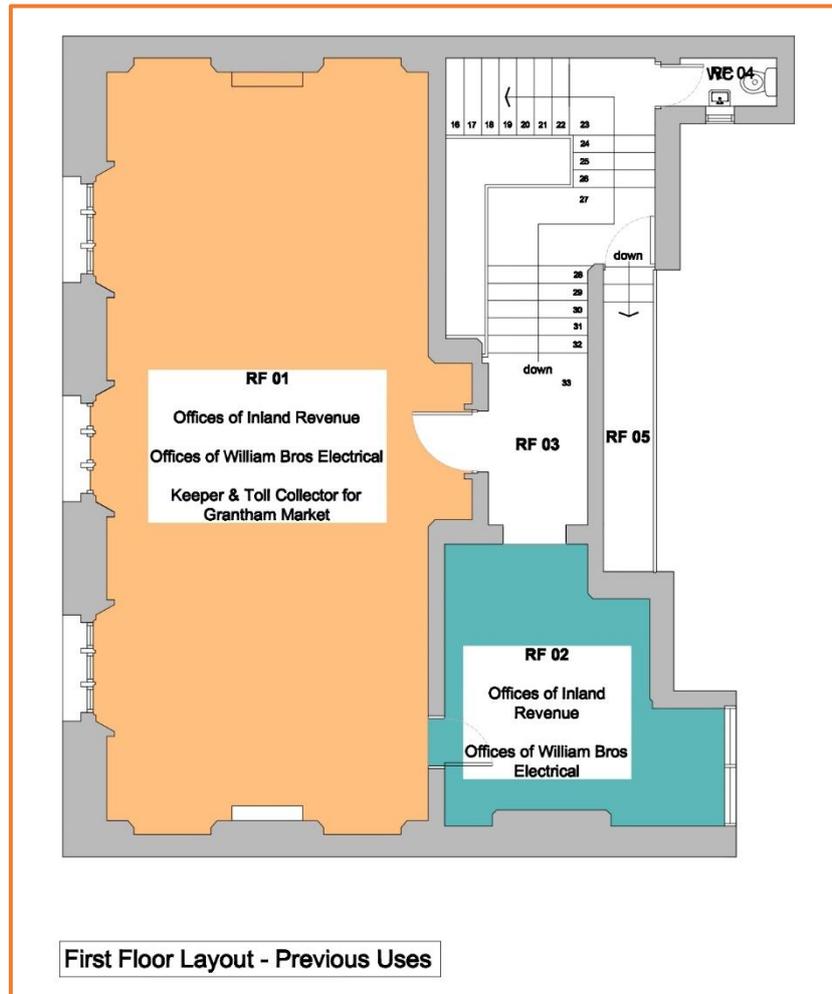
First Floor layout labelled with the previous uses of each room/area.
